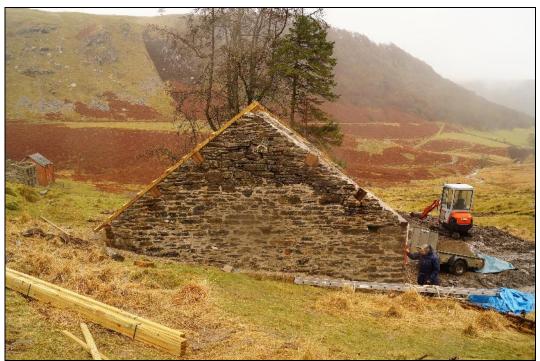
CEM2017_108. A view of the western gable wall of the former mine smithy. Looking east-northeast.
